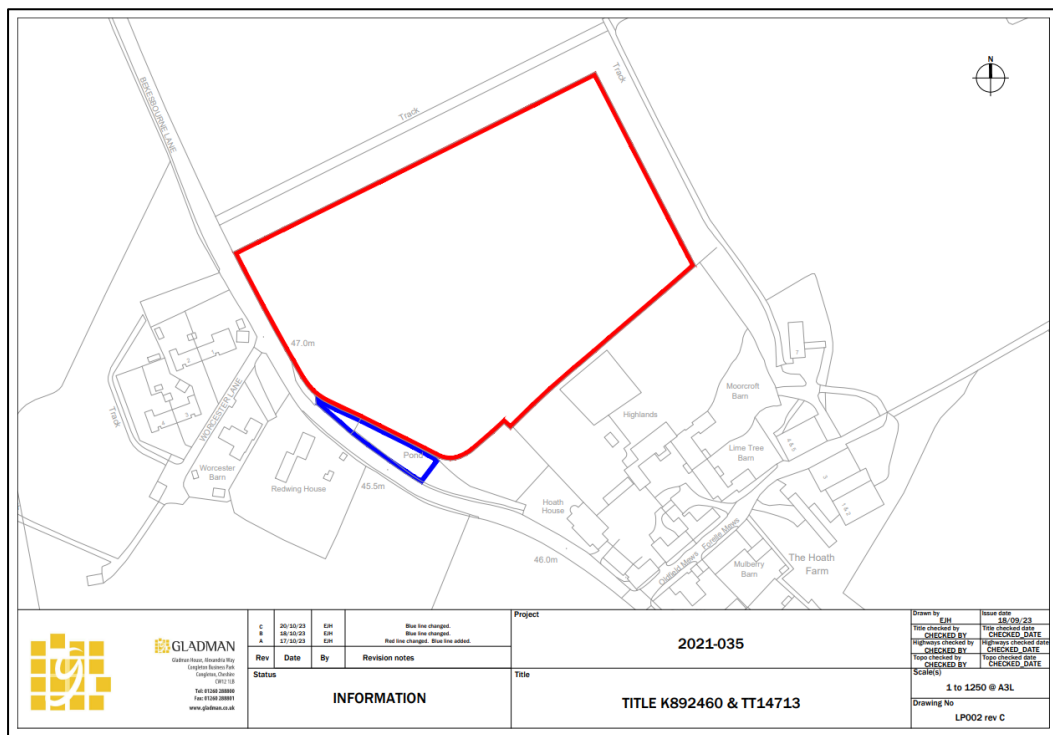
Site Location plan - Land north of Bekesbourne Lane at Hoath Farm, Canterbury.
